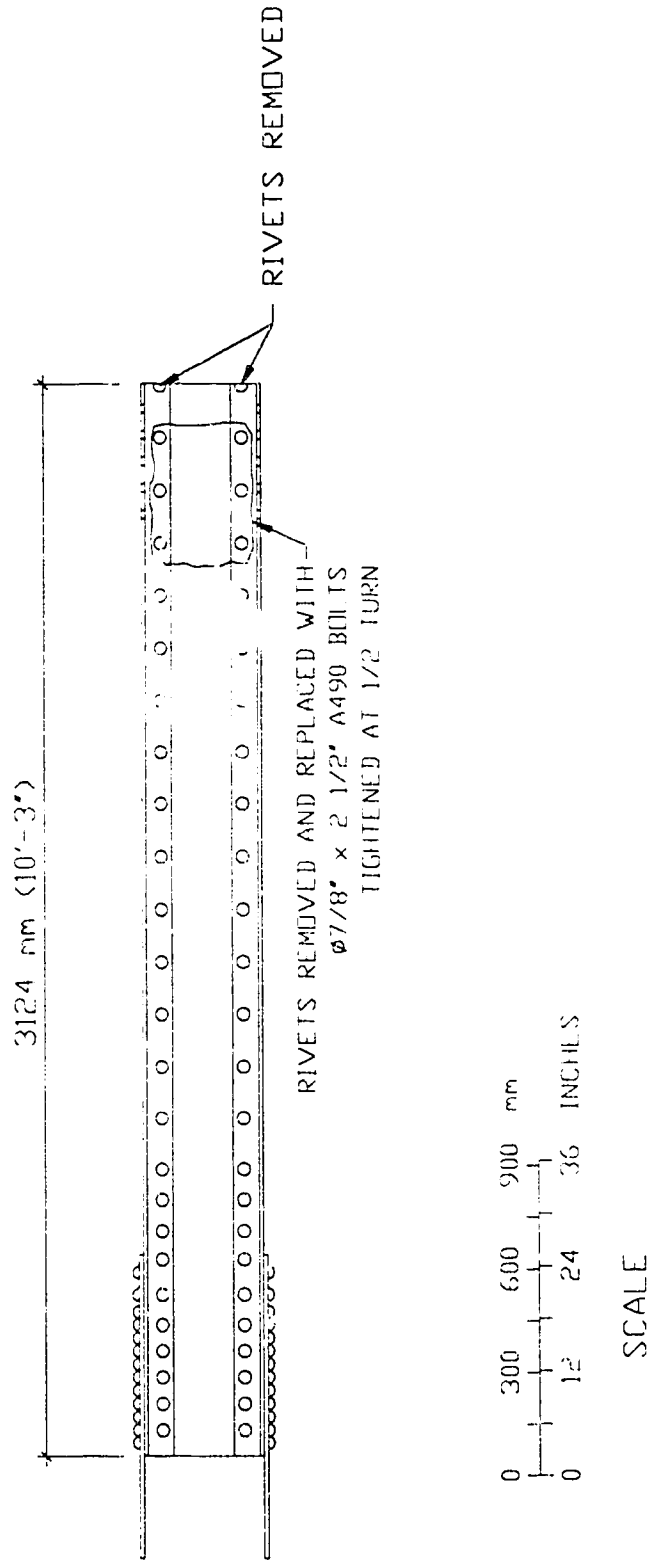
Rivets Replaced with Bolts to Prevent Cracking at Connection to Load Frame
